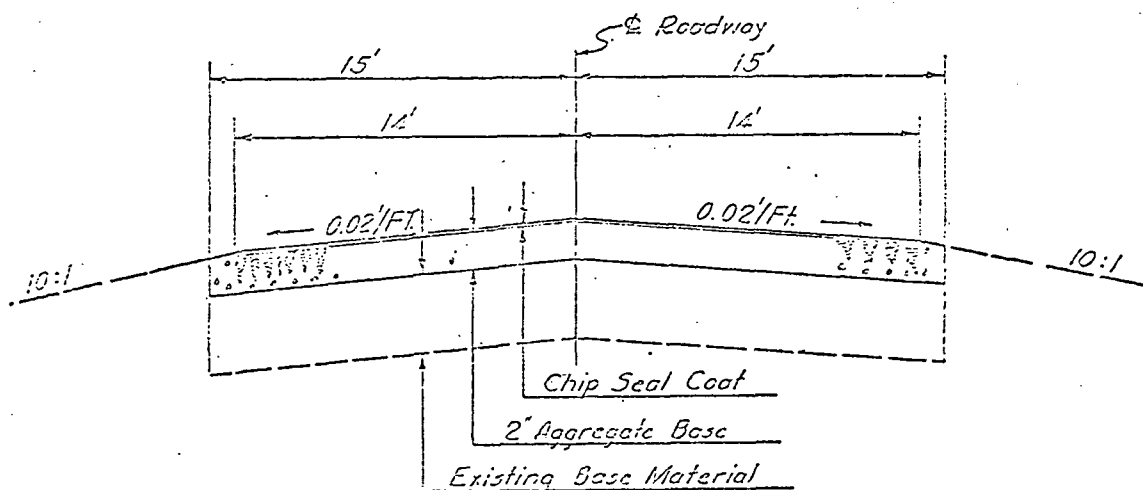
Profile of Typical Section for Chip Seal Road Surface Construction.
